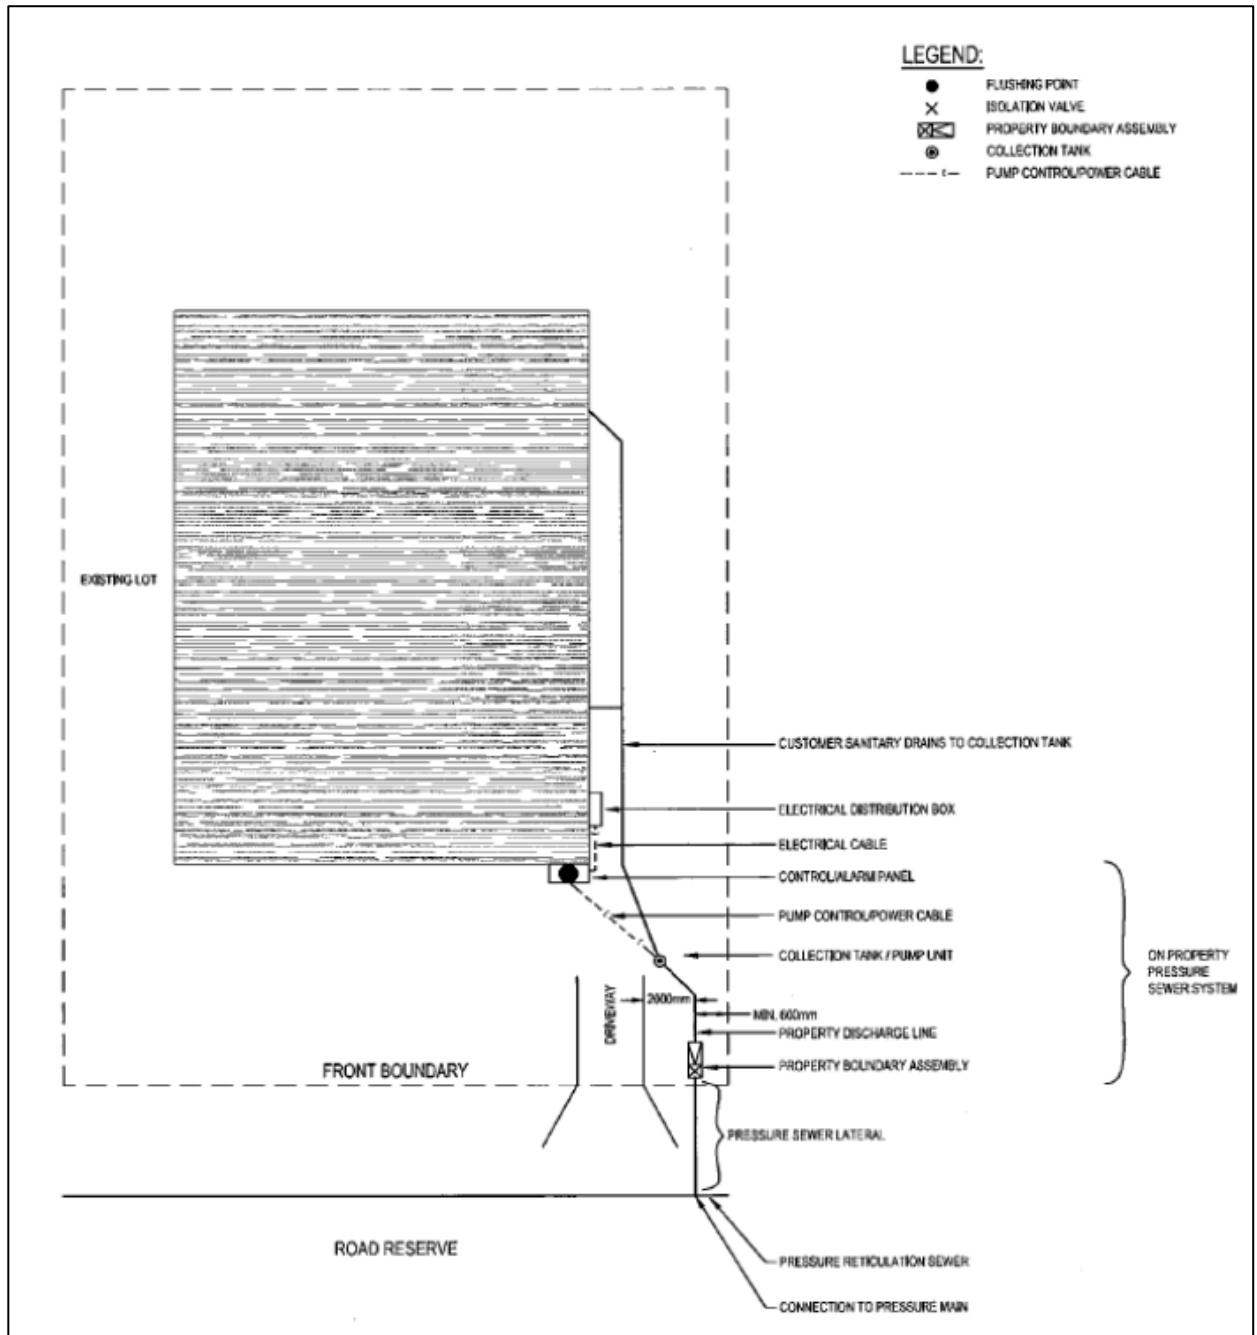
Typical Domestic Design Layout for Pressure Sewer
